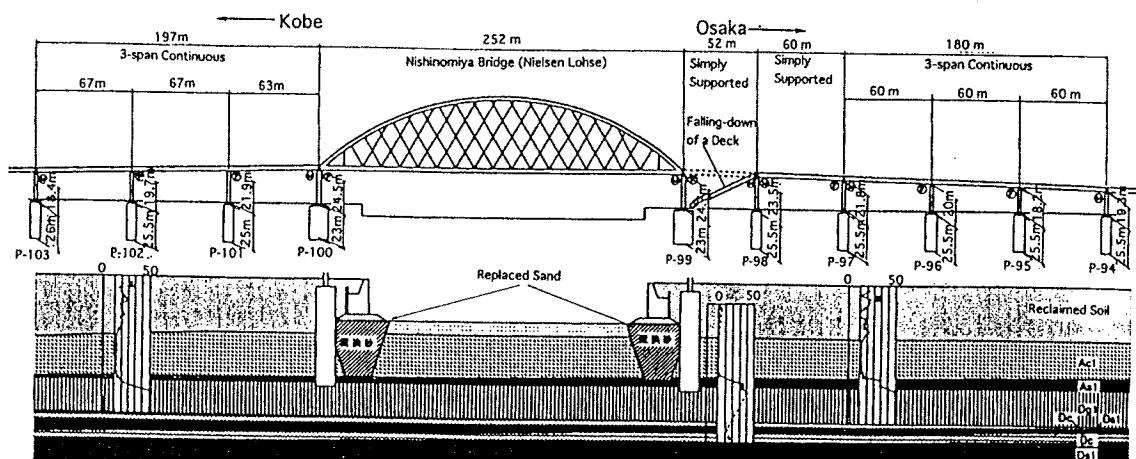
Nishinomiya Bridge and Approaching Bridges
